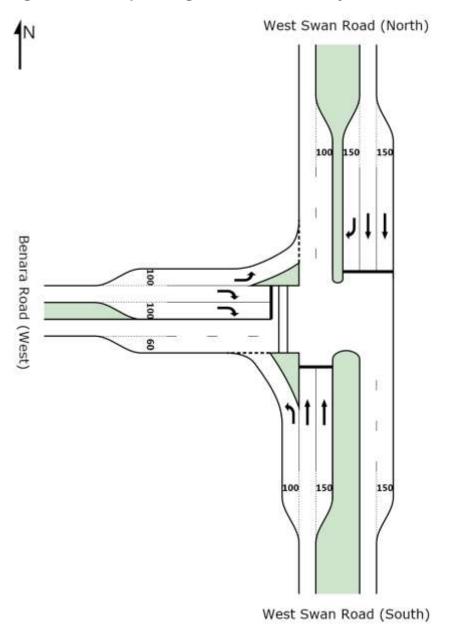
Proposed Signalised Intersection Layout of West Swan Road and Benara Road
